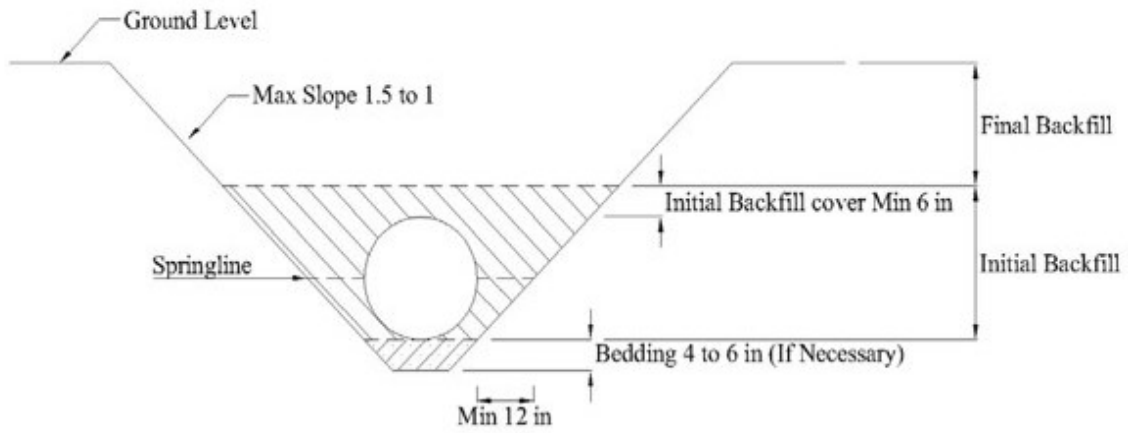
Trench Depth 5 to 12 feet: Sloped walls
